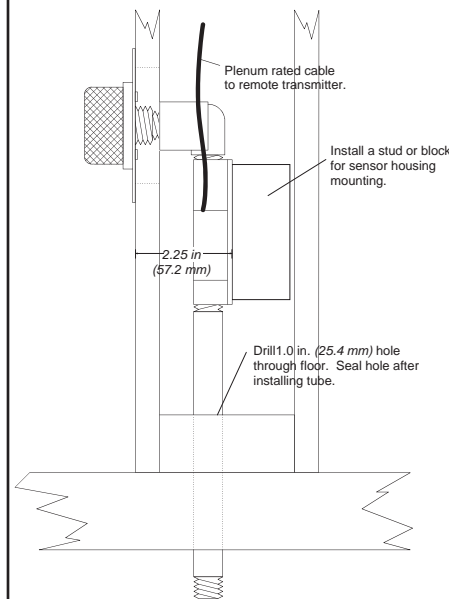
HB1/SB1 Underfloor Wall Mount Installation Detail
